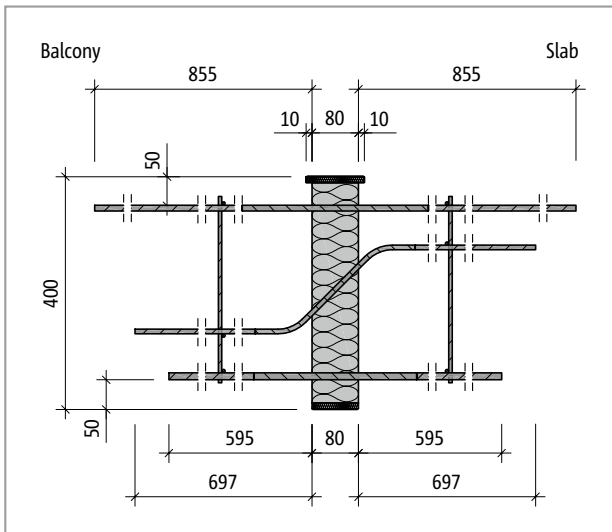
Schöck Isokorb® T type B-M1: Product section
